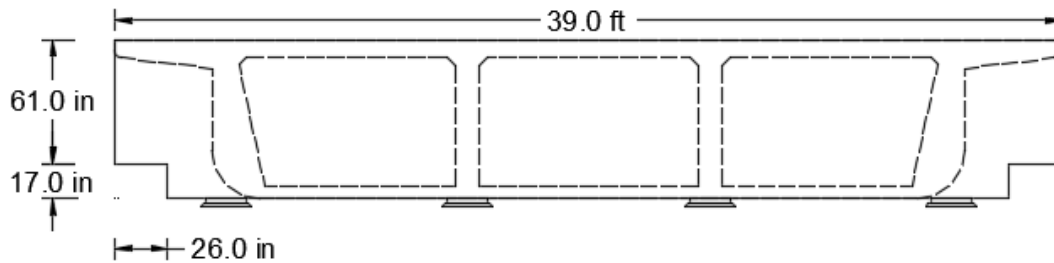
Cross-section view of the Airport Connector diaphragm at abutment with bearings under girders
